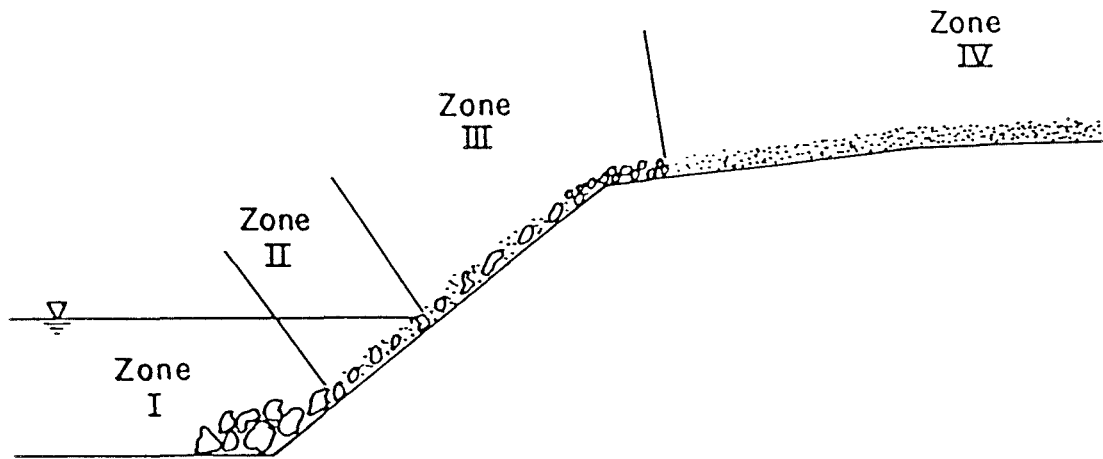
Zones of a reclaimed impoundment requiring riprap protection.
